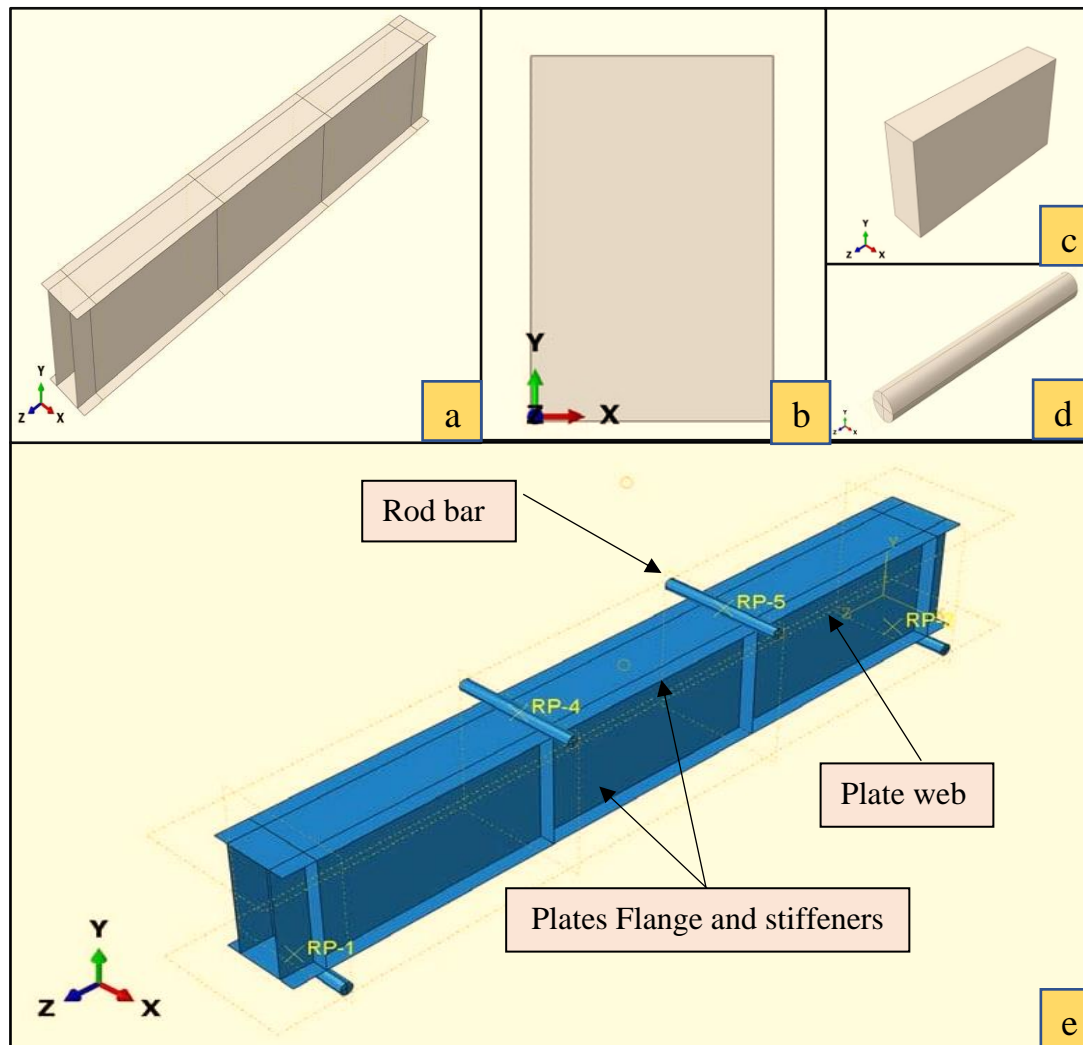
Assembling The Over All Parts of Composite Double Web Specimen
